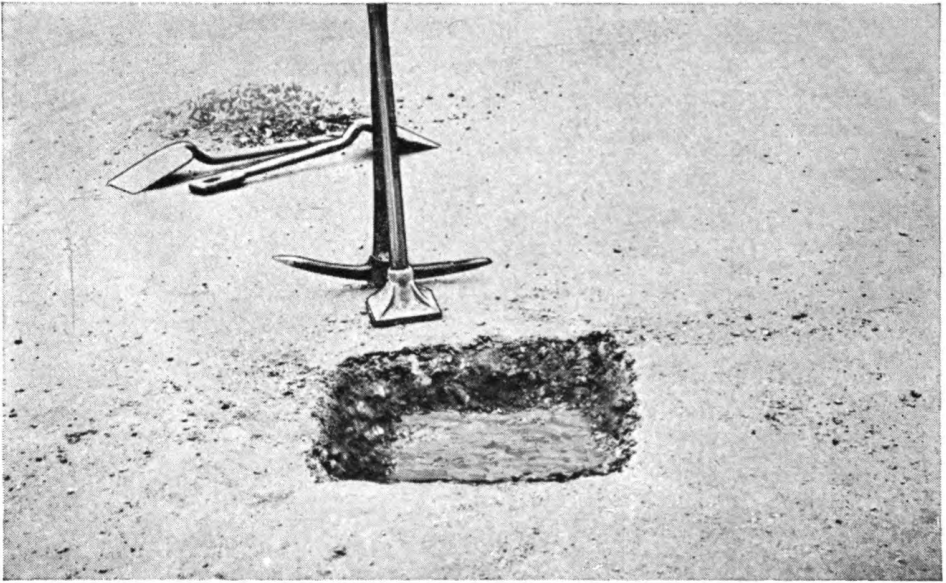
Hole in damaged pavement trimmed for patching.
